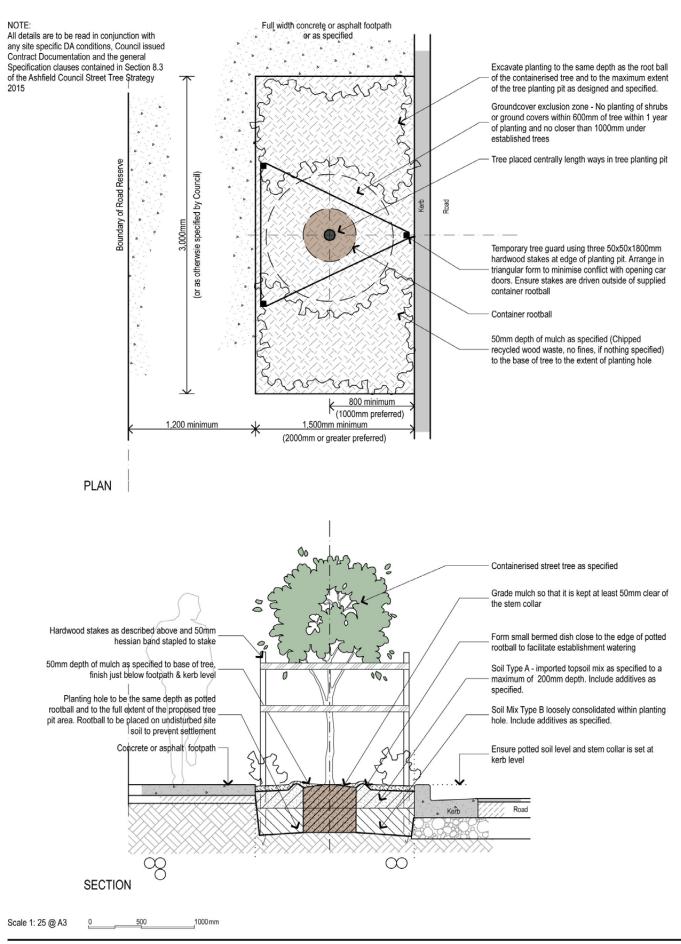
TREE PLANTING IN FULLY PAVED VERGE AND GOOD SURROUNDING SUBSOIL
